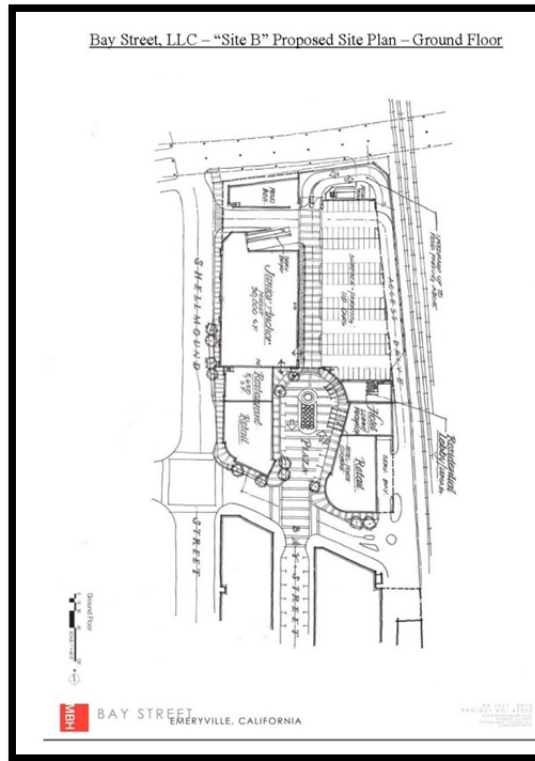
Madison Marquette Site B Junior Anchor Plan- Ground Floor
